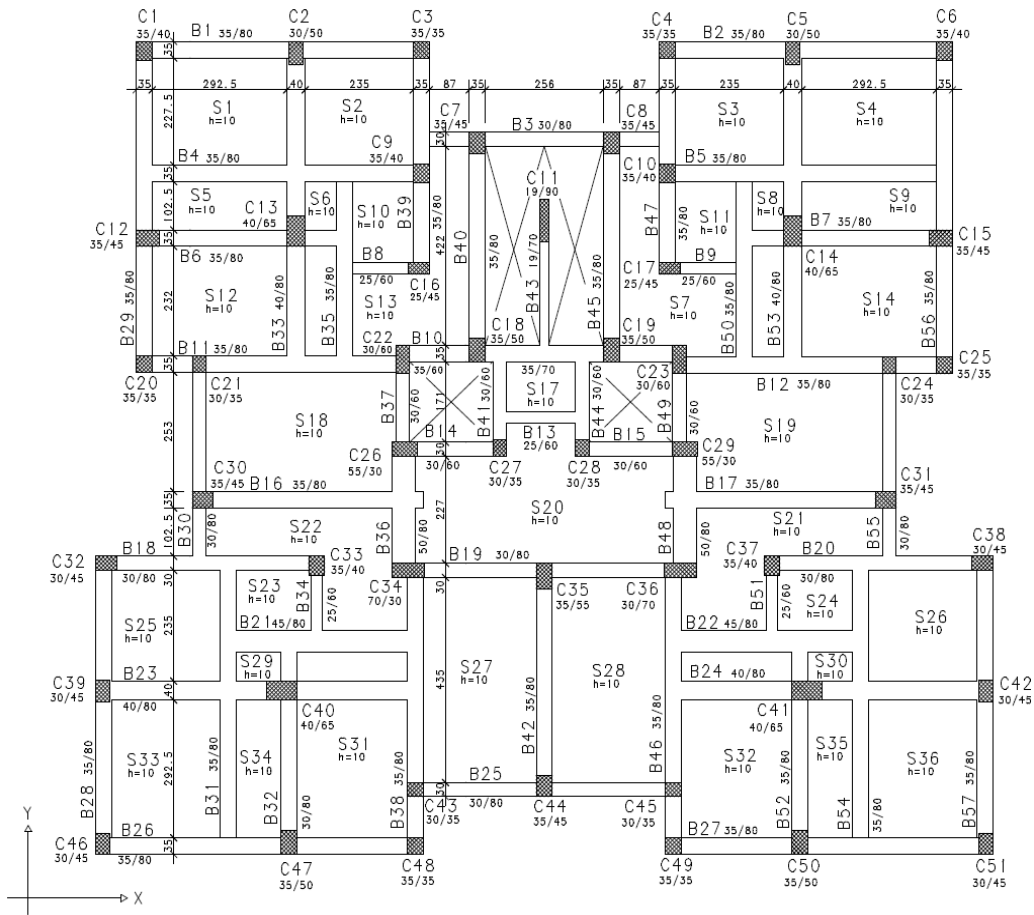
Formwork plan of the support concrete structure. Adapted: Medeiros [5].
